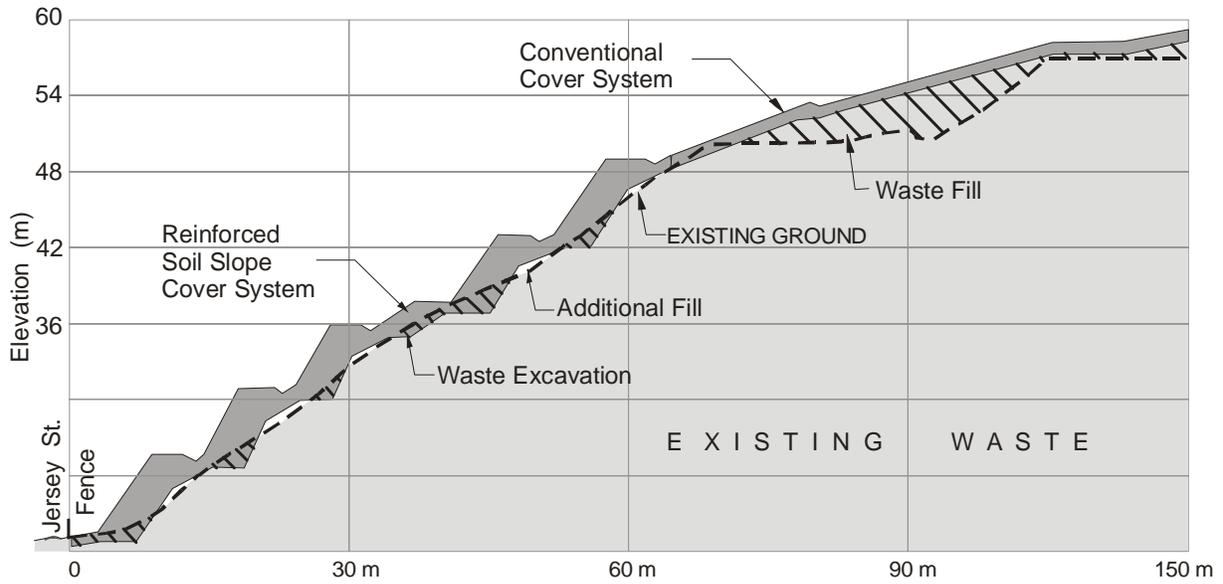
Reinforced Soil Slope Cover System on Steeper Slope Sections and Conventional Cover System on Shallower Slope Sections of a Hazardous Waste Landfill (modified from Cargill and Olen, 1997, 1998).
